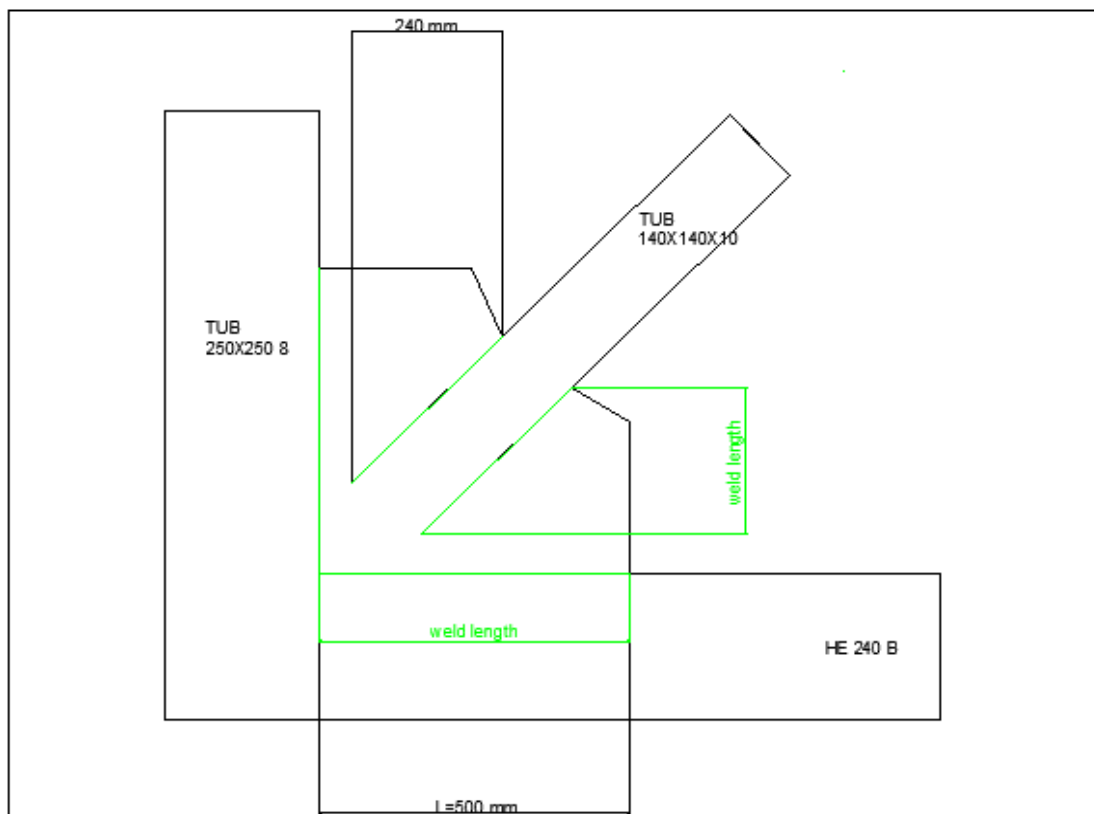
sketch of joint between braces and main beams (Auto desk)
